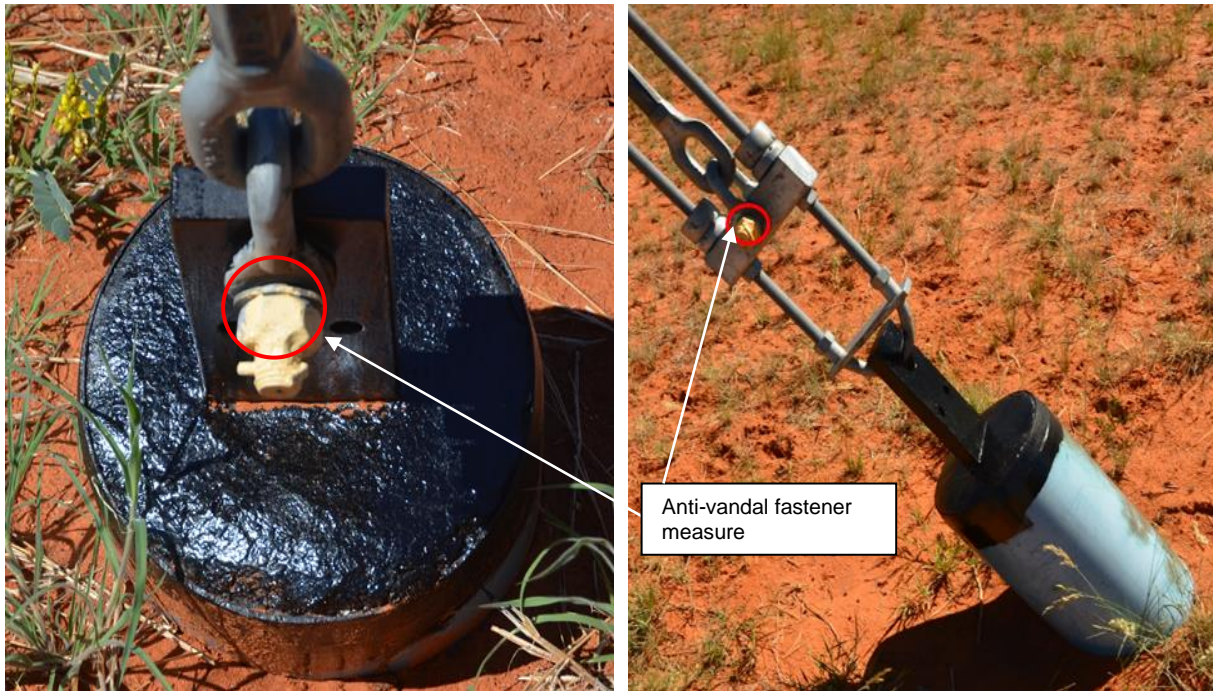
Guy anchor connection example – welded nut-to-bolt
